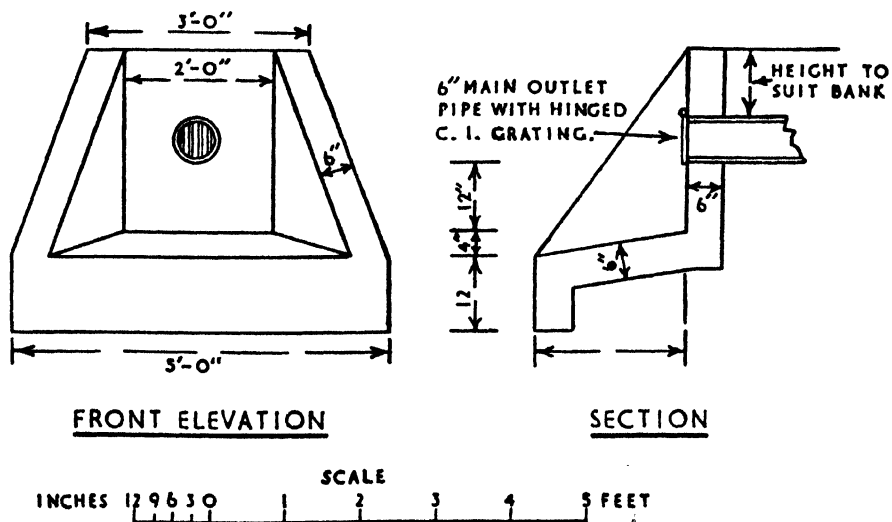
TYPICAL CONCRETE OUTLET TO STREAM OR DITCH
